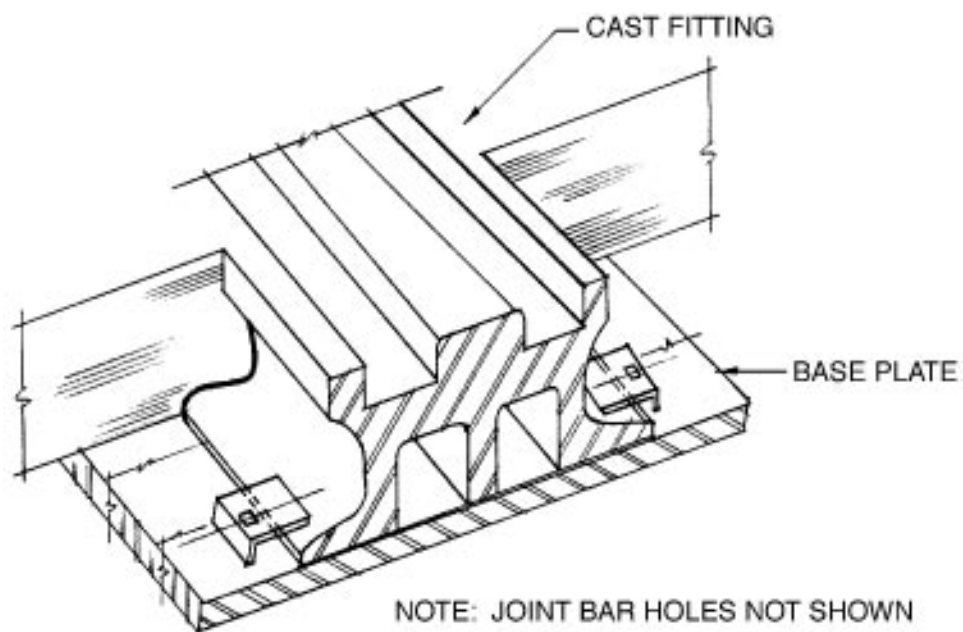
Fitting with Double Flangeway Extension Attached by Rail Clips.
